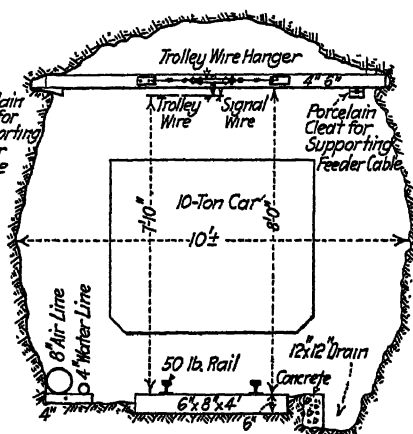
CROSS-SECTION OF UNTIMBERED TUNNEL.
